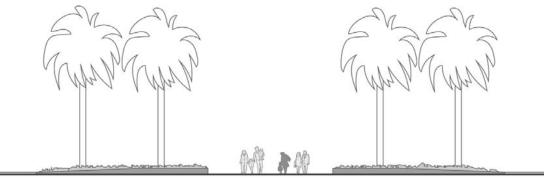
Cross section of the raised planter beds at the non-signalised pedestrian crossing
